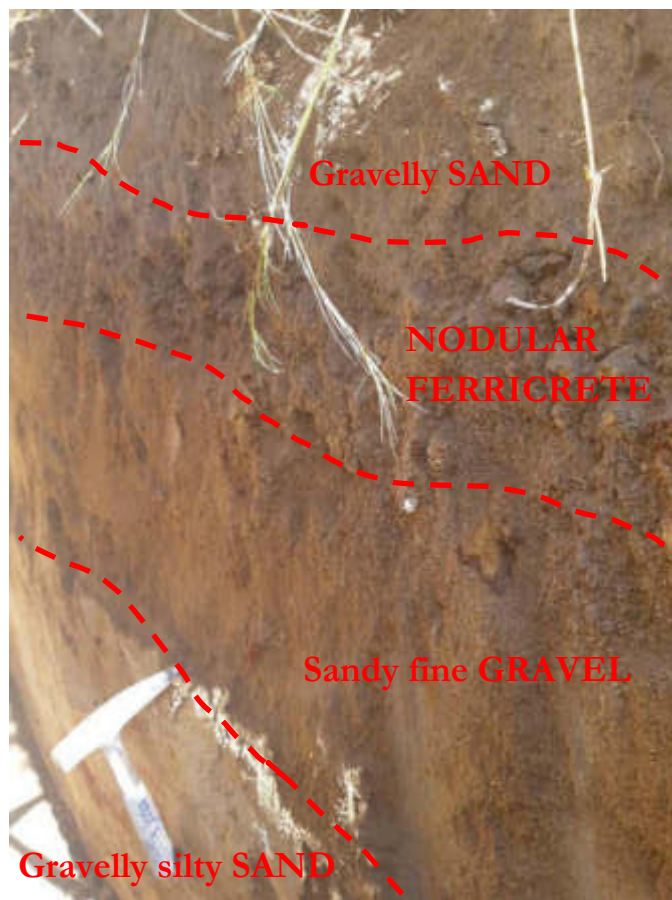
TP15 – Close-up of trial pit sidewall showing various horizons encountered.
